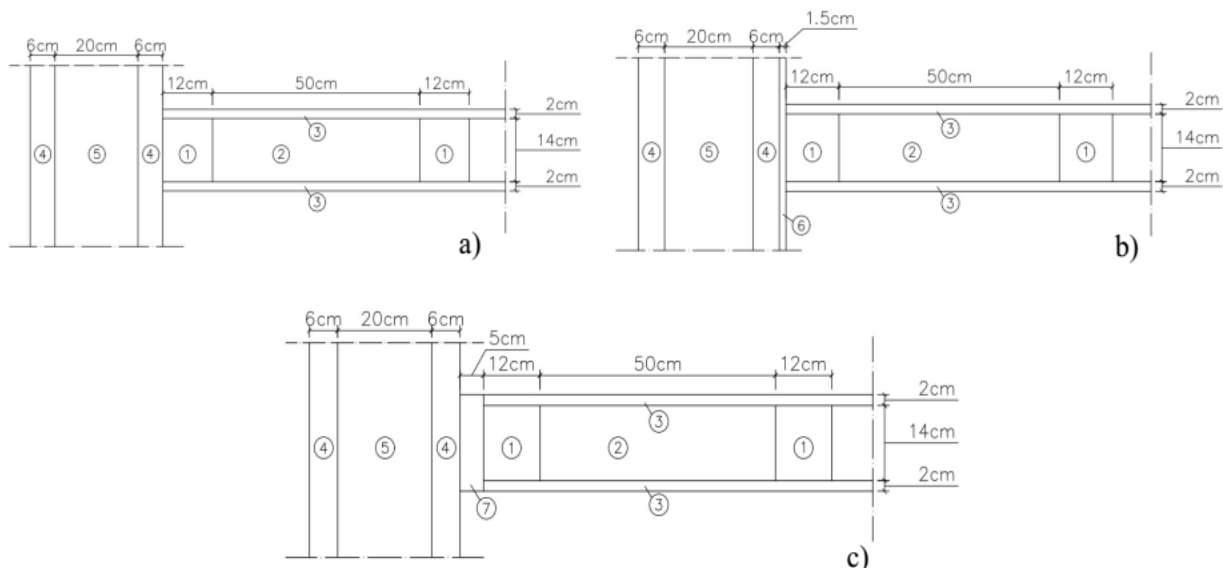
Characteristic detailing of a timber floor structure in rural houses: a) without thermal insulation, b) with insulation of mortar or gypsum board, c) with stone wool insulation at the contact with the chimney. Legend: 1-timber frame element, 2-void cavity, 3-timber solid panels as floor covering or ceiling, 4-chimney shaft, 5-chimney flue, 6-mortar or gypsum plasterboard, 7-stone wool.
